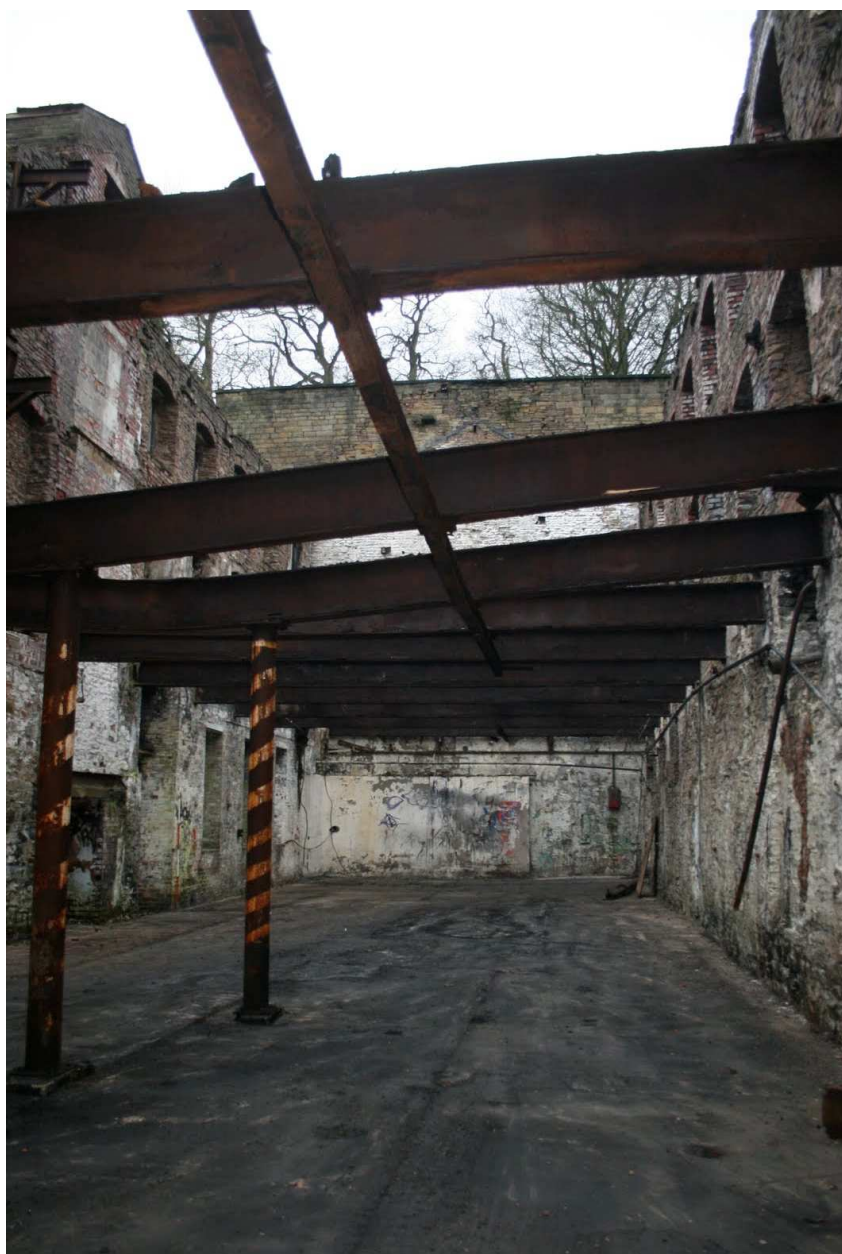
Inserted steel beams for the repositioned first floor level, Building I
